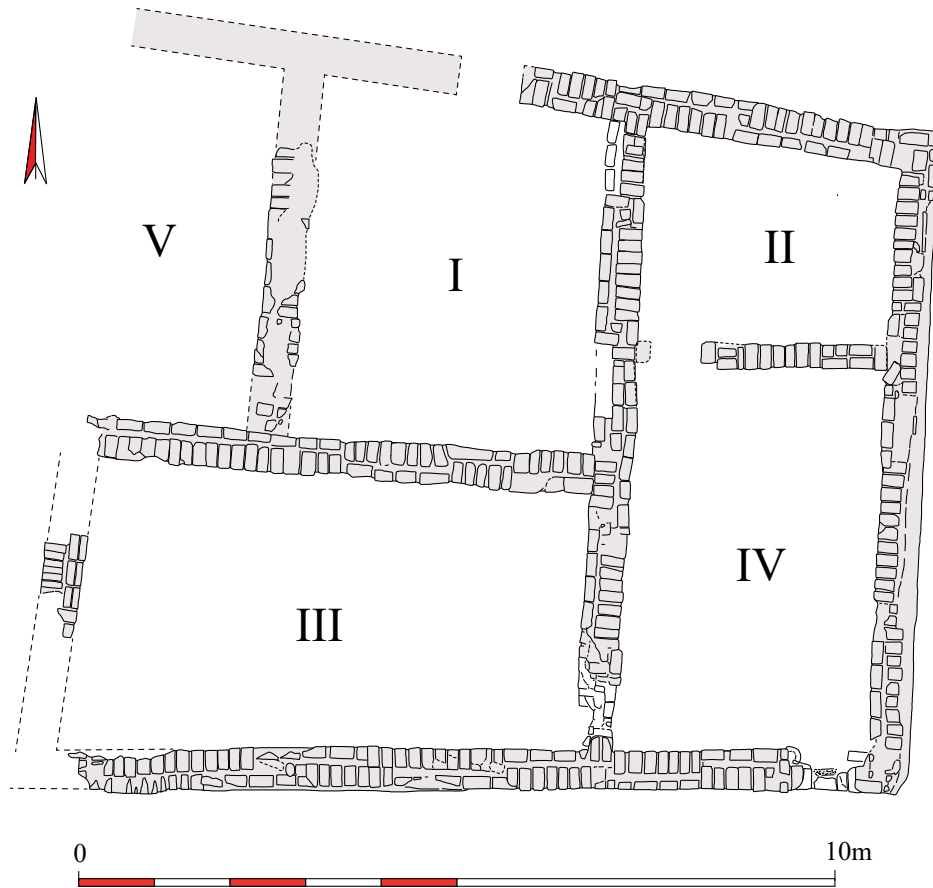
Building 1, Period 2, Phase 2 (scale 1:100).
